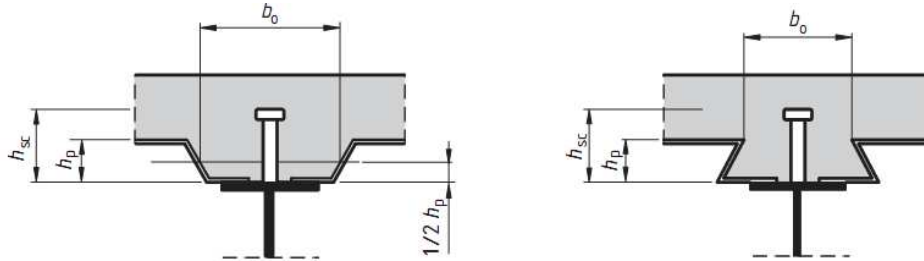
Beam with profiled steel sheeting parallel to the beam
